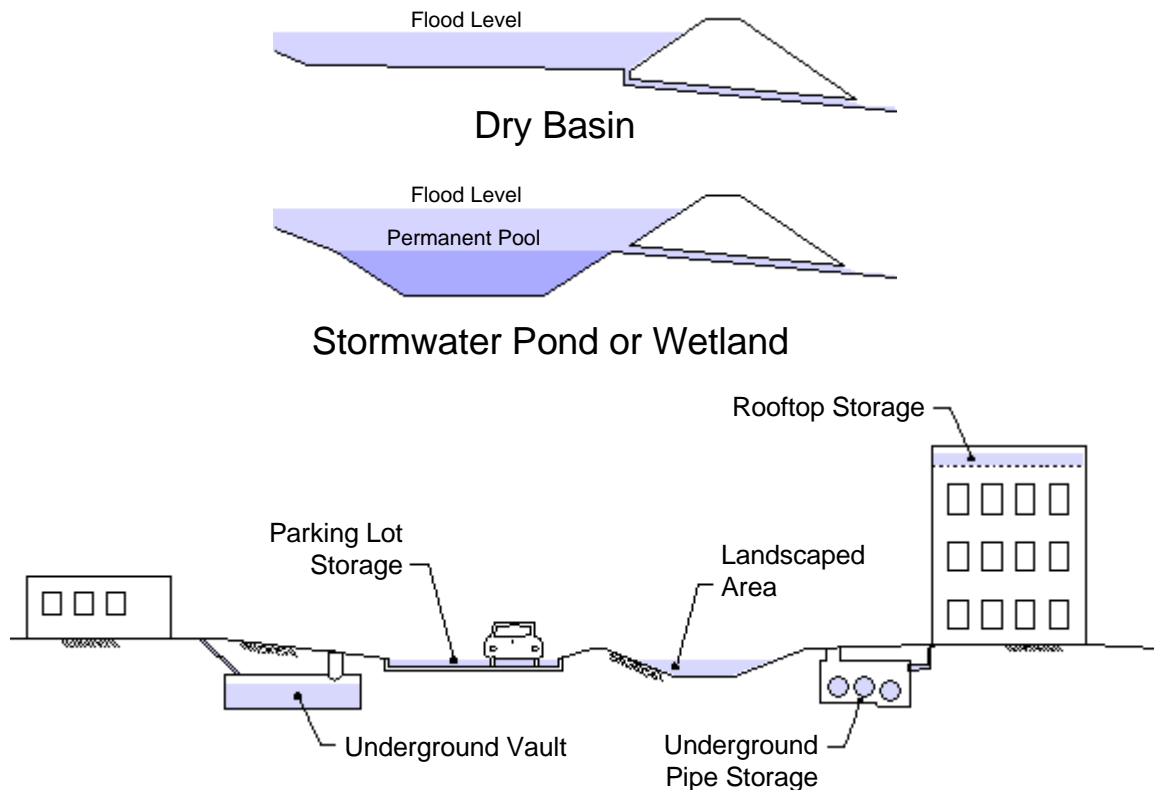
Examples of Typical Storm Water Storage Facilities
